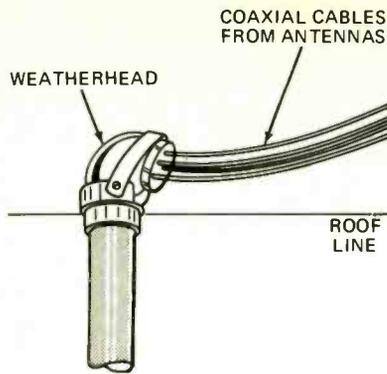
WEATHERHEAD should be used to run cables indoors.
